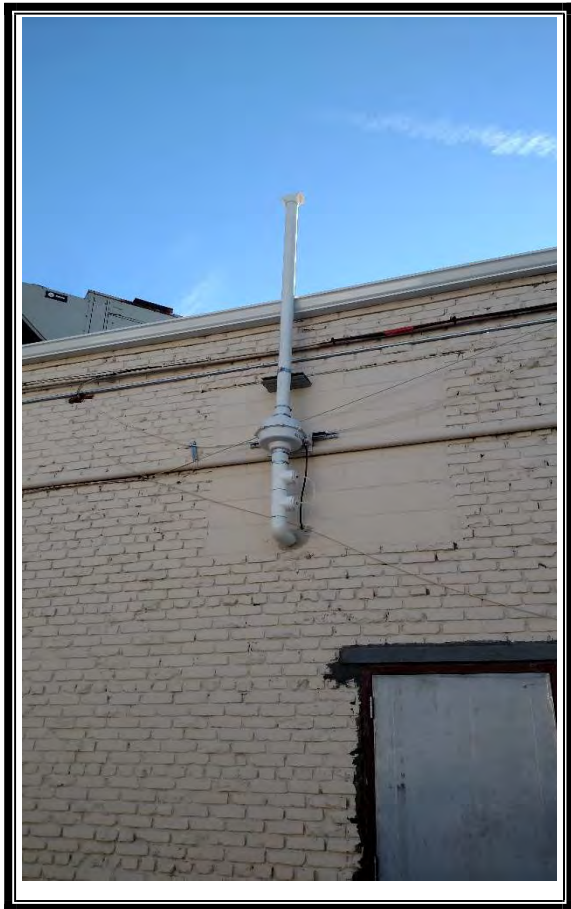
Radon fan located on outside wall of former dry cleaner.
